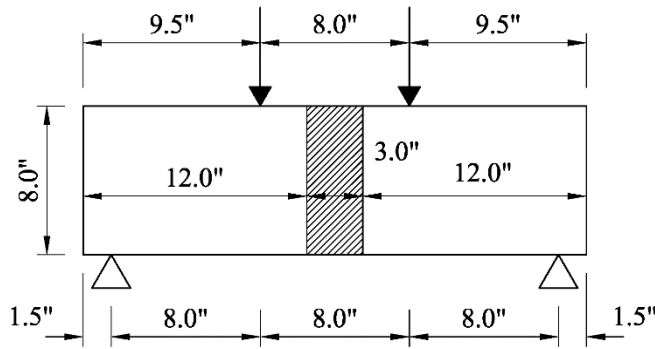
Details of test specimens for ASTM C78 with flat joint
